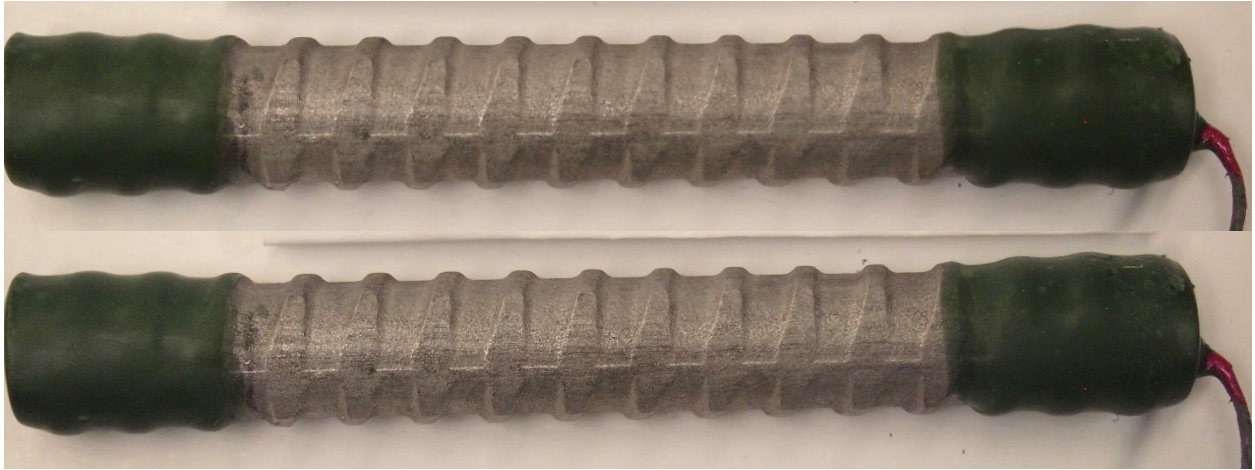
Specimen PKSBT-04 before testing (top) and after testing (bottom)
